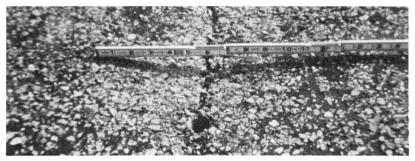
A typical pilot hole drilled at the thermal cracks allows the truss sections to be inserted with it's nozzles.
